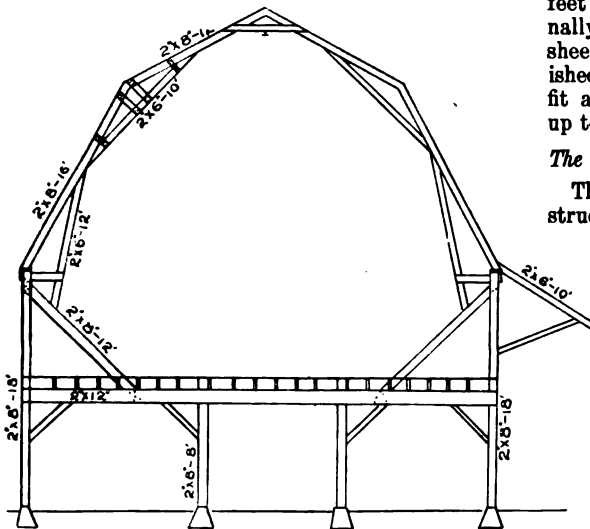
Cross-section of the Wing joist-frame barn construction. The roof is self-supporting and the interior is open.
